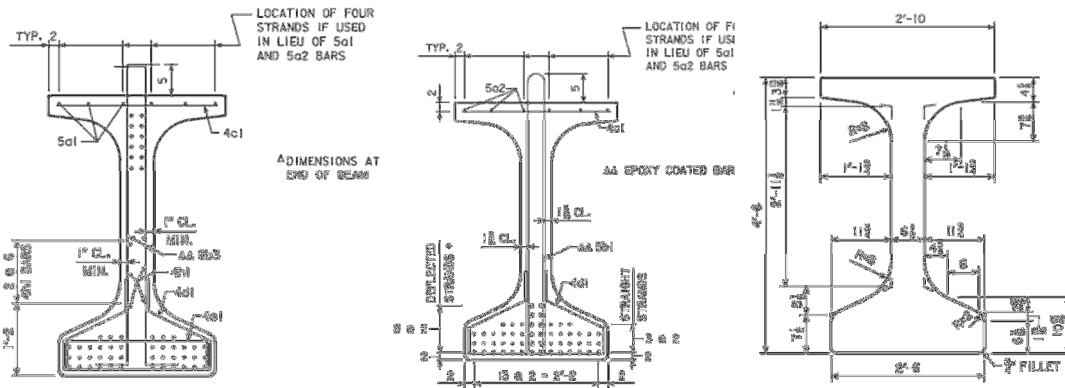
Cross section of the end span, the mid-span and the gross cross section of BTD 135 girder
